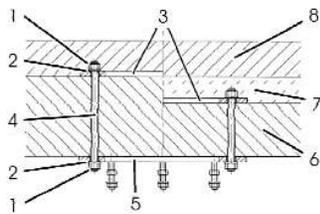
Overview ceiling cut; left half without and right half with footfall sound insulation
